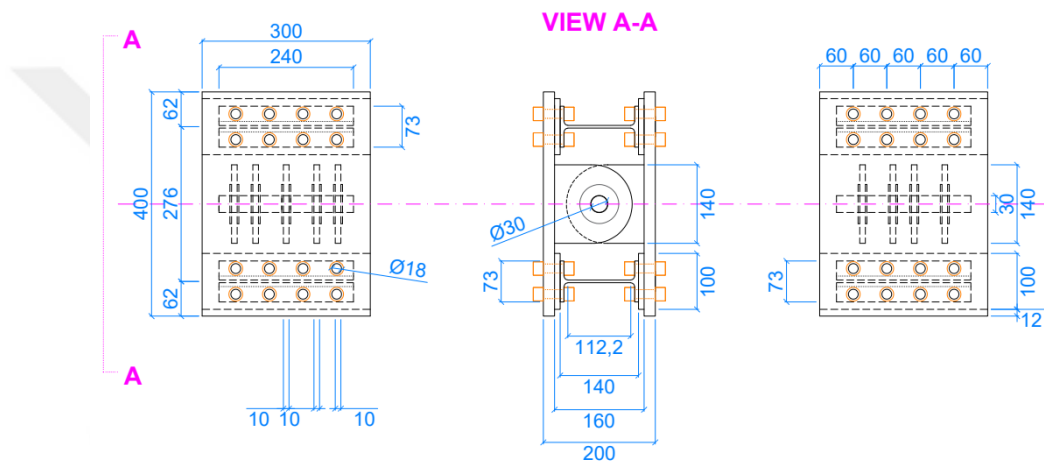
2D drawings of PT3. Dimensions in mm.
